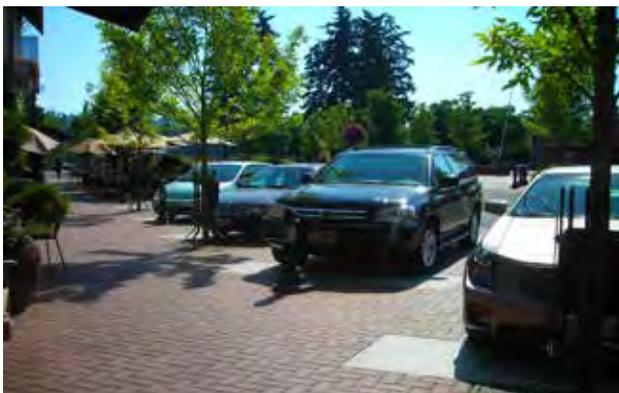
D.2.e: Permeable pavement allows water to infiltrate the soil thereby reducing stormwater discharge.
